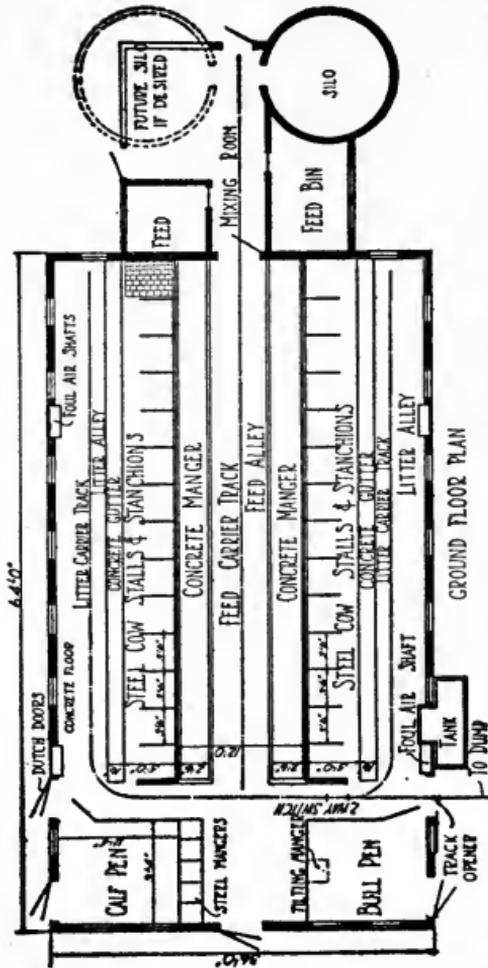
Floor Plan of Dairy Stable, Showing One Silo Complete and the Other Outlined, to be Built Some Time in Future
